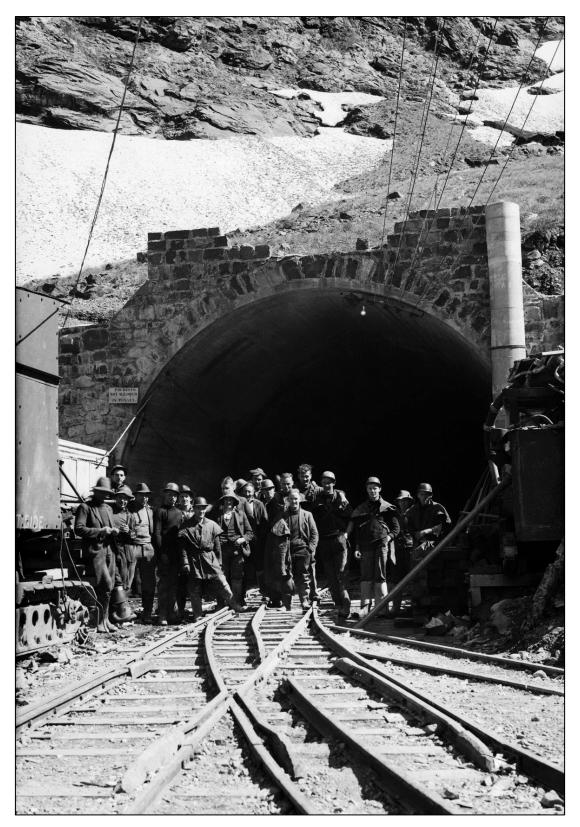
Completion of the eastern tunnel portal in 1936 (some stonemasonry work was still outstanding to the stone façade parapet).³⁶
